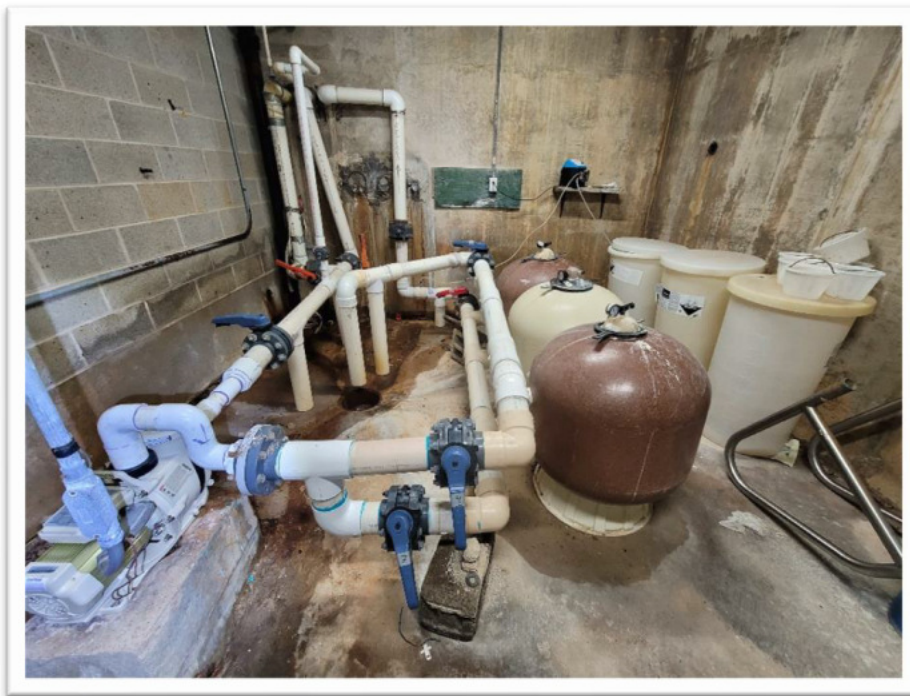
Severe leakage through and around the mechanical system and pipes.
